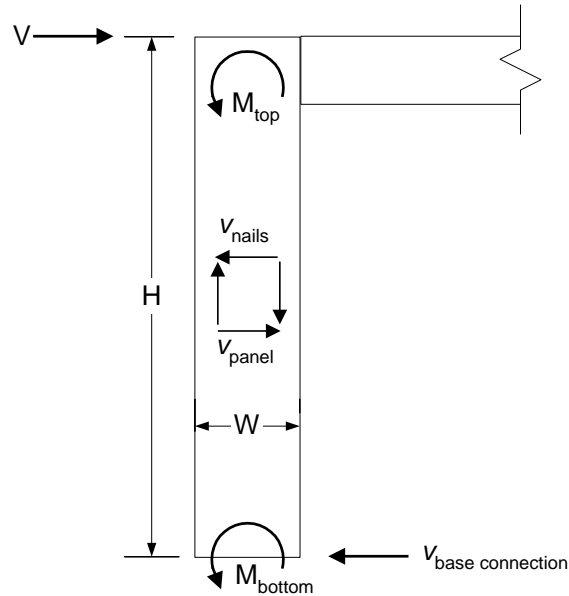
PRINCIPLES OF MECHANICS MODEL TO PREDICT THE STRENGTH OF THE WOOD STRUCTURAL PANEL PORTAL FRAME
